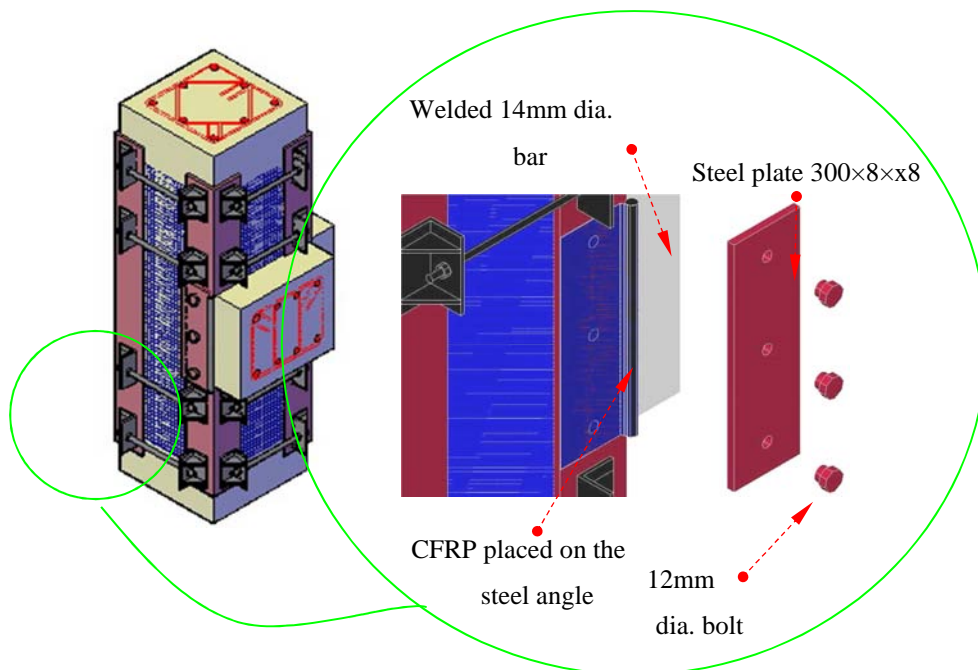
3D corner RC joint, strengthening with steel cage and GFRP [25]
